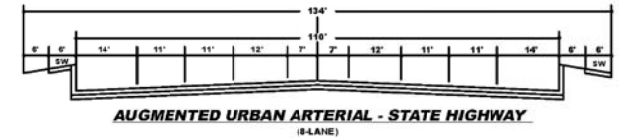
B CITY OF LAKE ELSINORE GENERAL PLAN CIRCULATION ELEMENT AND RECOMMENDED ROADWAY CROSS-SECTIONS
